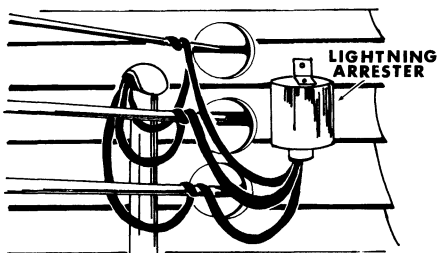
Lightning arresters protect the building's electrical wiring system.
